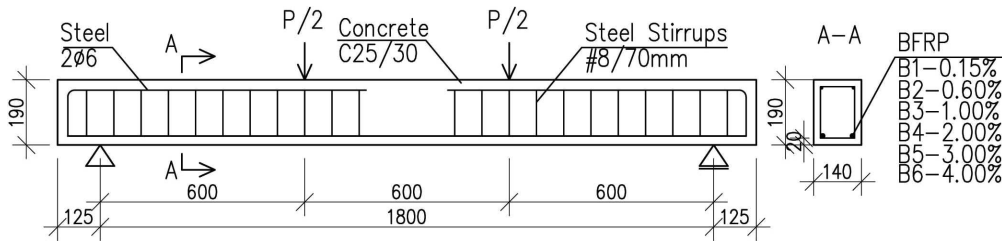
Geometry and reinforcement of specimen (dimensions in mm).
